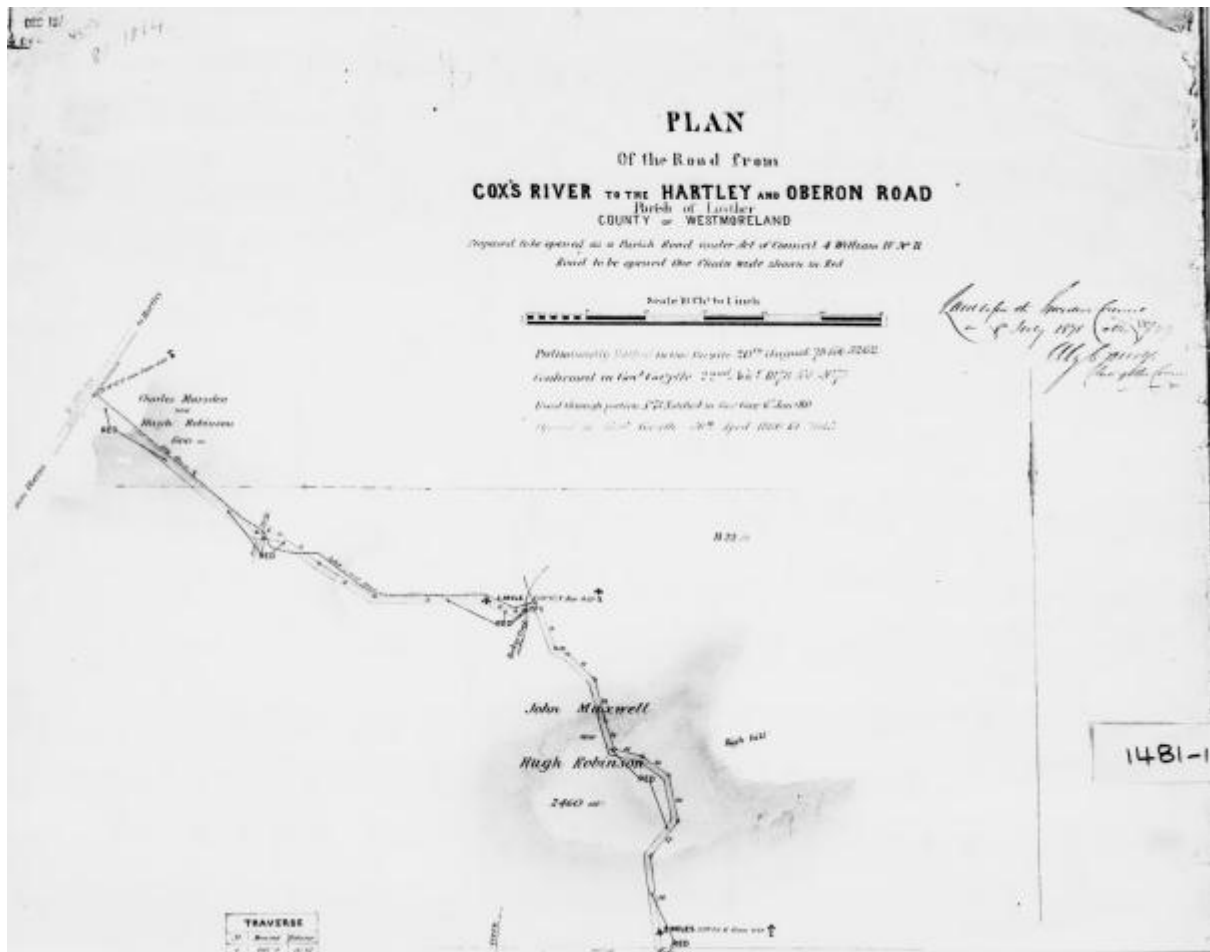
“Plan of the Road from Cox’s River to Hartley and Oberon Road” showing John Maxwell’s 2460 acres, 1880 (Source: LPI 1481-1603 Sheet 2)
